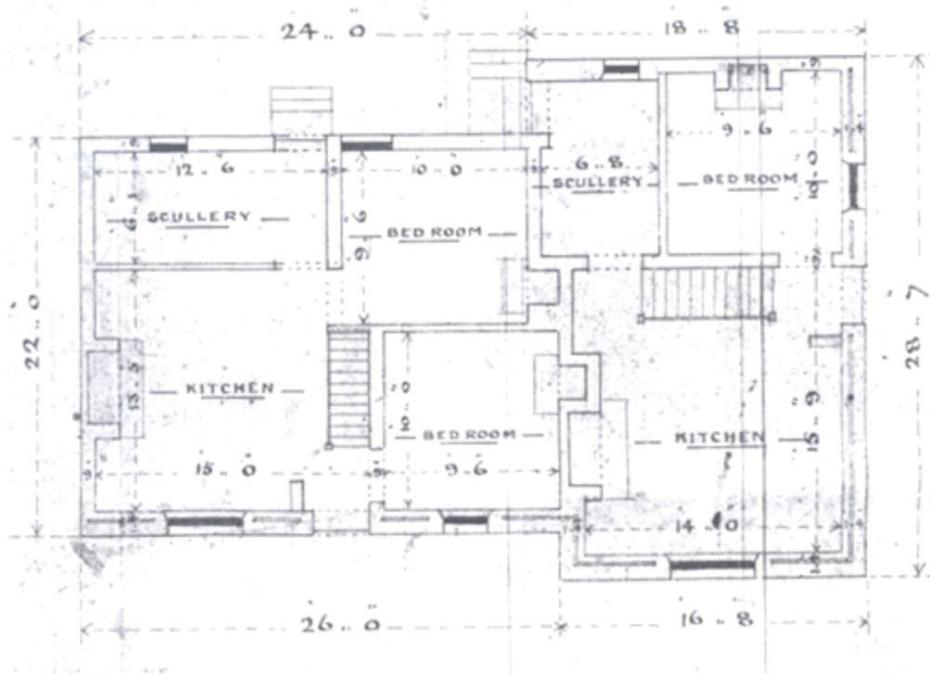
Carter's Cottages, ground plan. (c1890)
